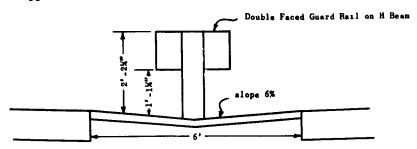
Cross section between Hackensack and Passaic R.R. bridges New Jersey Turnpike.
